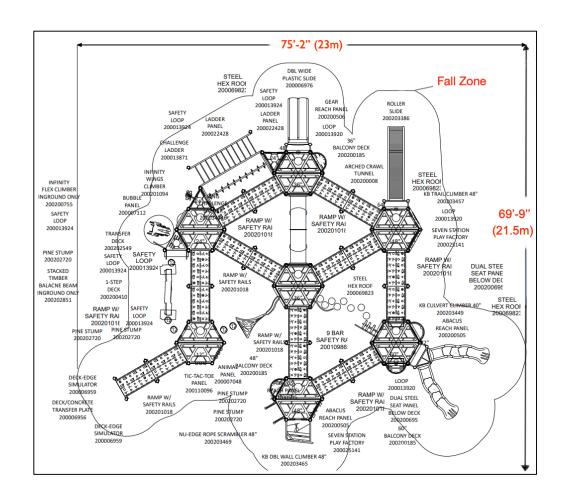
Plan view of the playground equipment on the South play area with design specifications
